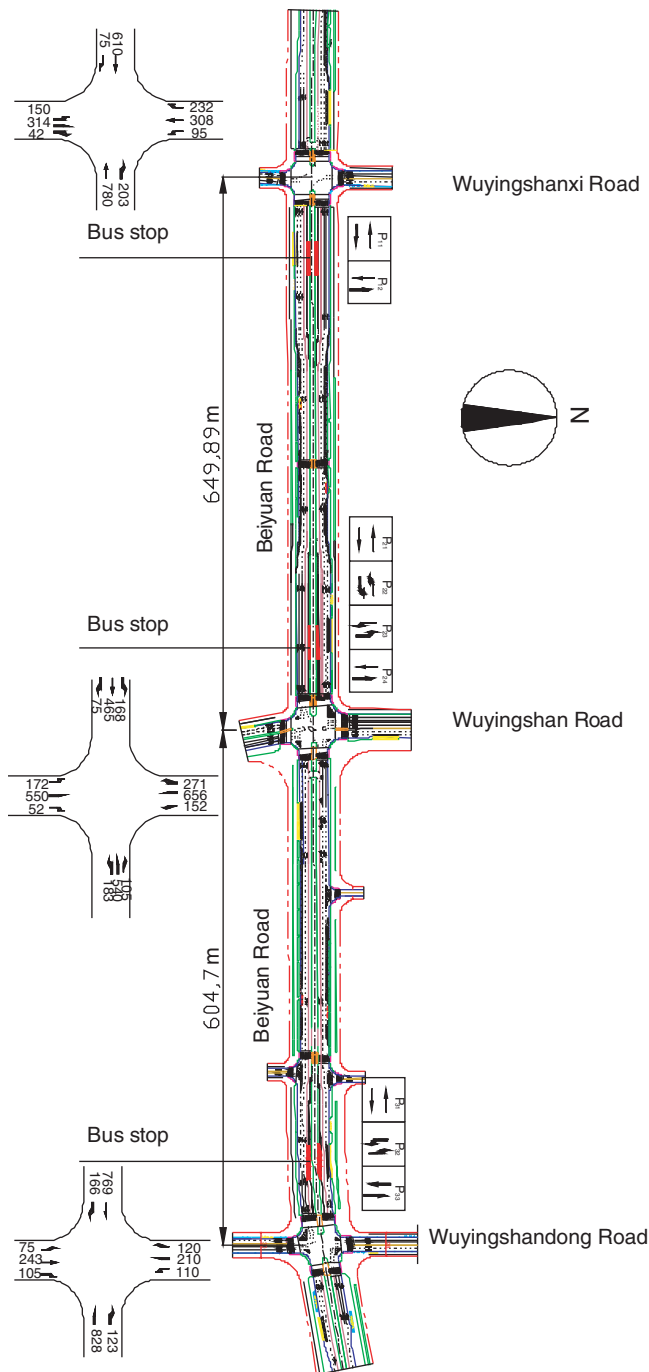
Layout of Wuyingshan Road intersection groups, Ji'nan City.
